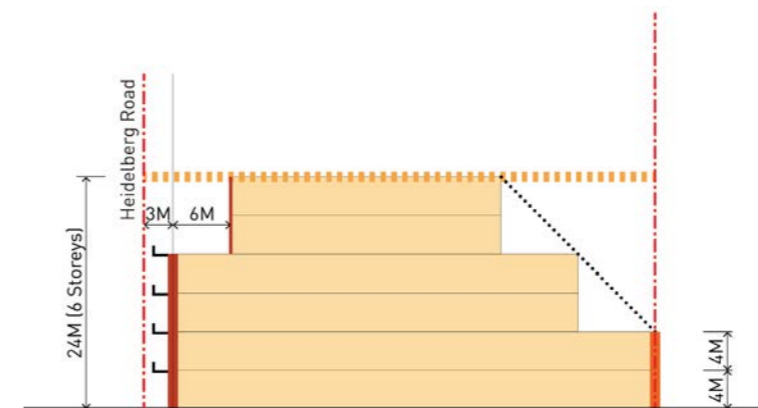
Examples of Heidelberg Road built form testing which considers alternate street and rear interface conditions
